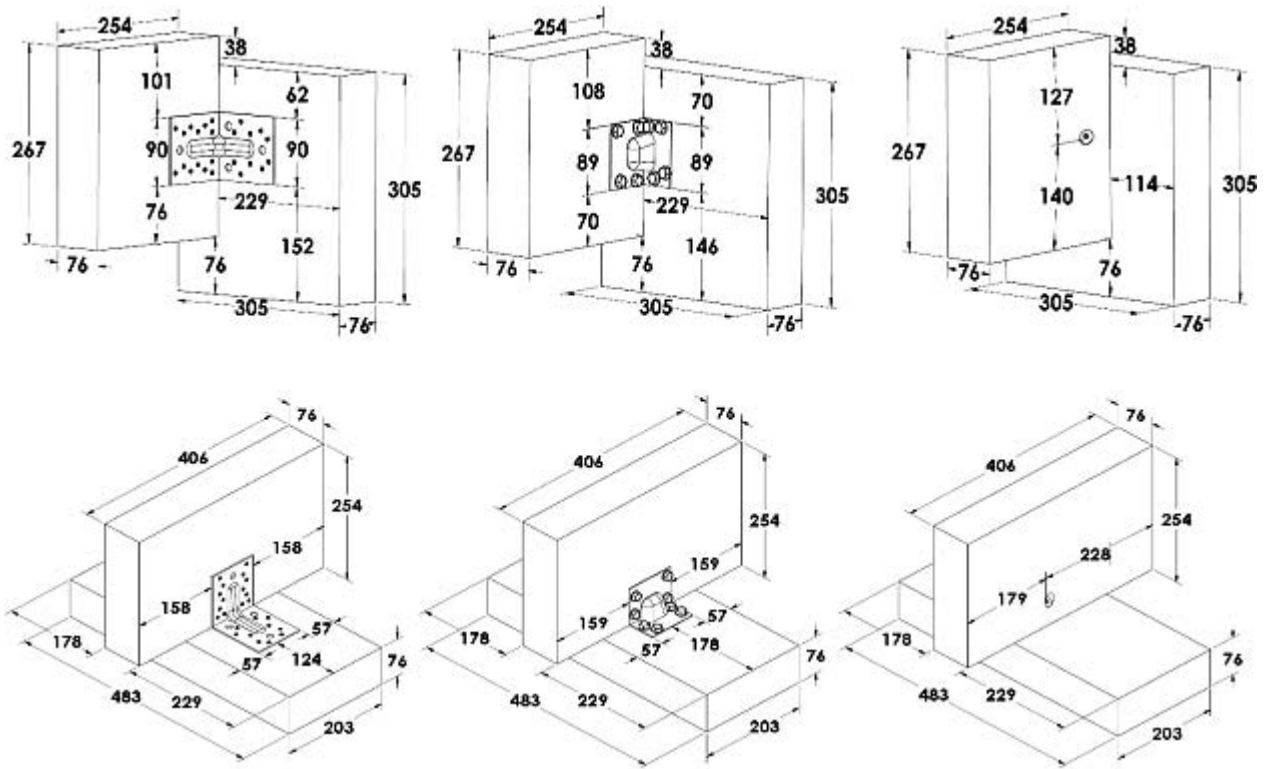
Shear samples (top) with ABR, HGA, and toe screw (right to left). All dimensions are in millimeters (mm). Withdrawal samples (bottom) with ABR, HGA, and toe screw (right to left). All dimensions are in millimeters (mm).
